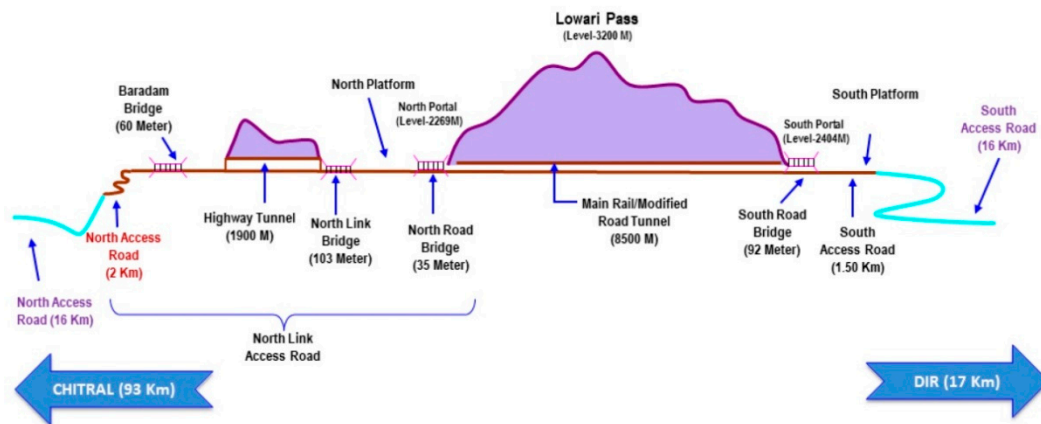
Layout plan of the Lowari tunnel project comprising two tunnels of 8.5 and 1.9 km with access roads and bridges. The maximum overburden at the main tunnel was recorded as 1250 m.
